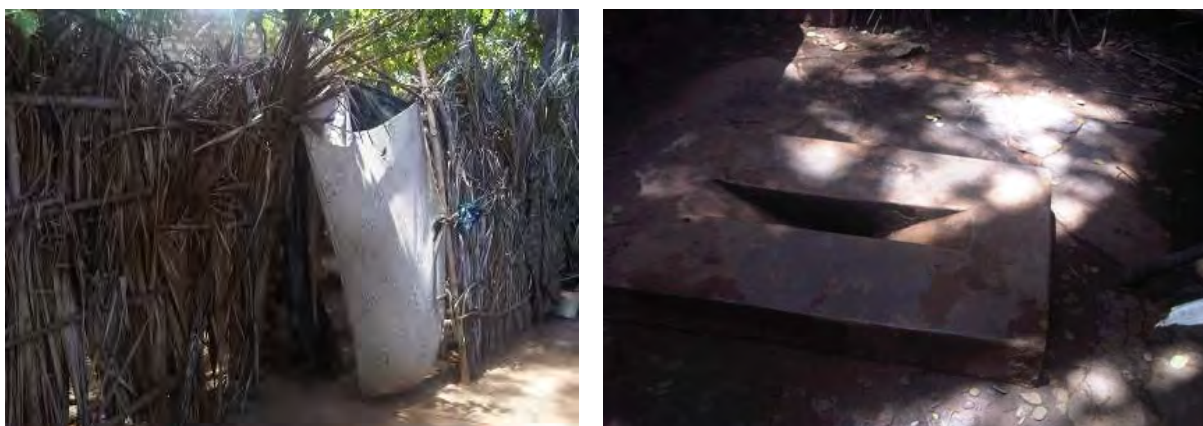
(i) Typical Makuti Toilet (ii) Concrete Slab. Both serve as Bathrooms
